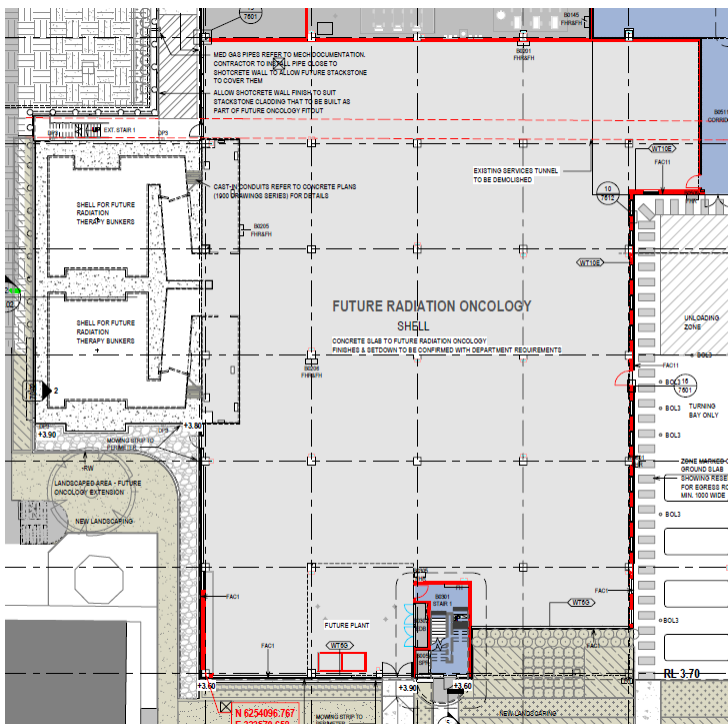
GA- BASEMENT LEVEL ZONE 2 RL 4.0 (Approved Modification 5 Plan)
